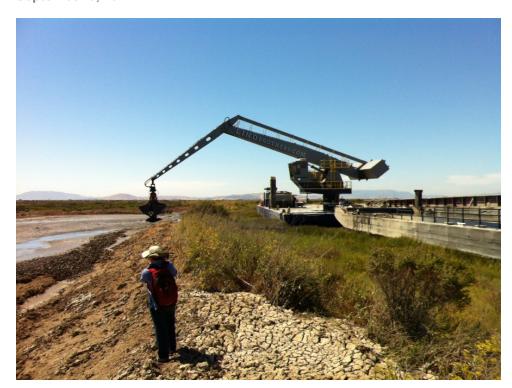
Offloader placing dredged material on inboard side of levee at Cullinan Ranch.
